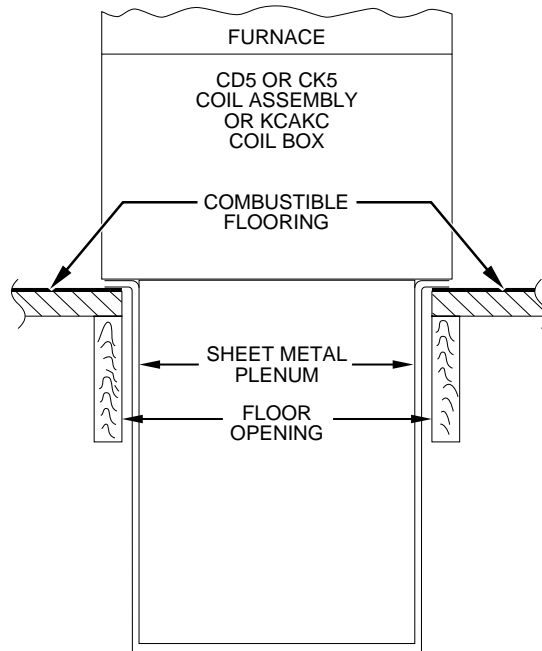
Furnace, Plenum, and Coil Assembly or Coil Box Installed on a Combustible Floor
